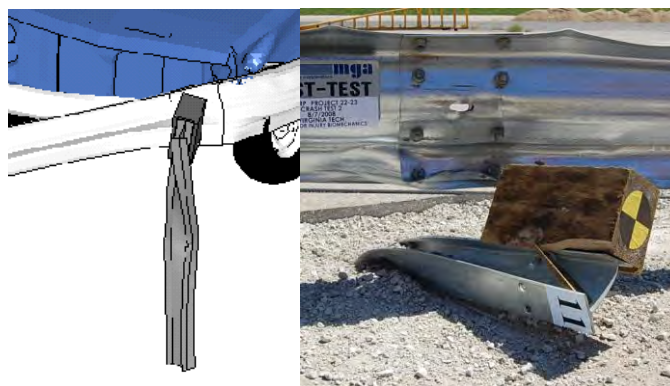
Typical damage mode for steel wide-flange posts.[Fleck08b]
